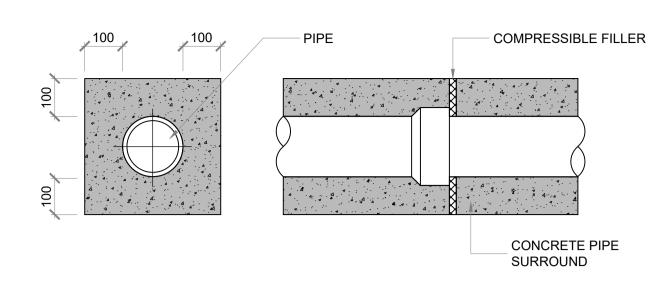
JOINTS FOR CONCRETE ENCASED PIPES SPIGOT AND SOCKET JOINT
